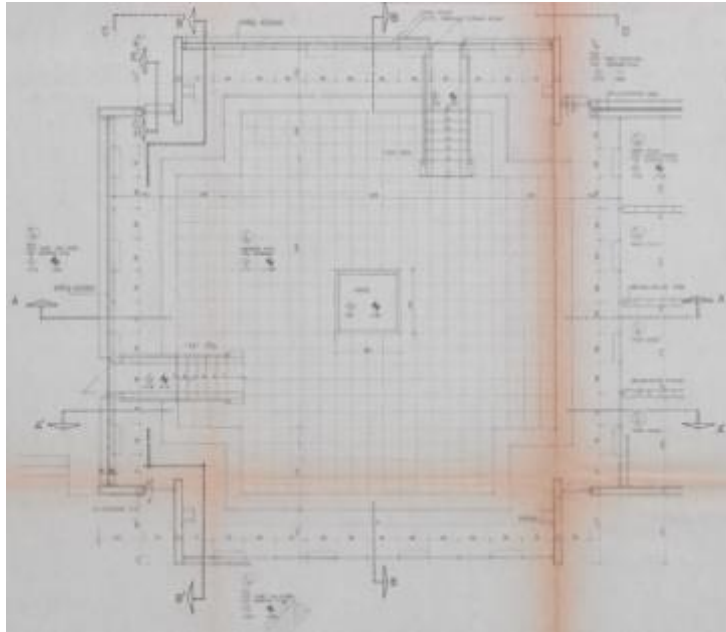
AI28 Sheet illustrates the partial inner courtyard plan. (METU Archives)
